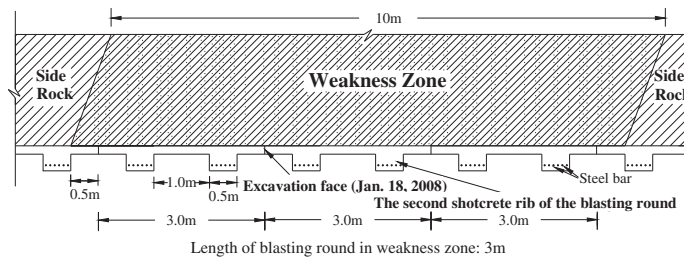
Position of reinforced shotcrete ribs in weakness zone (longitudinal profile of tunnel roof).
